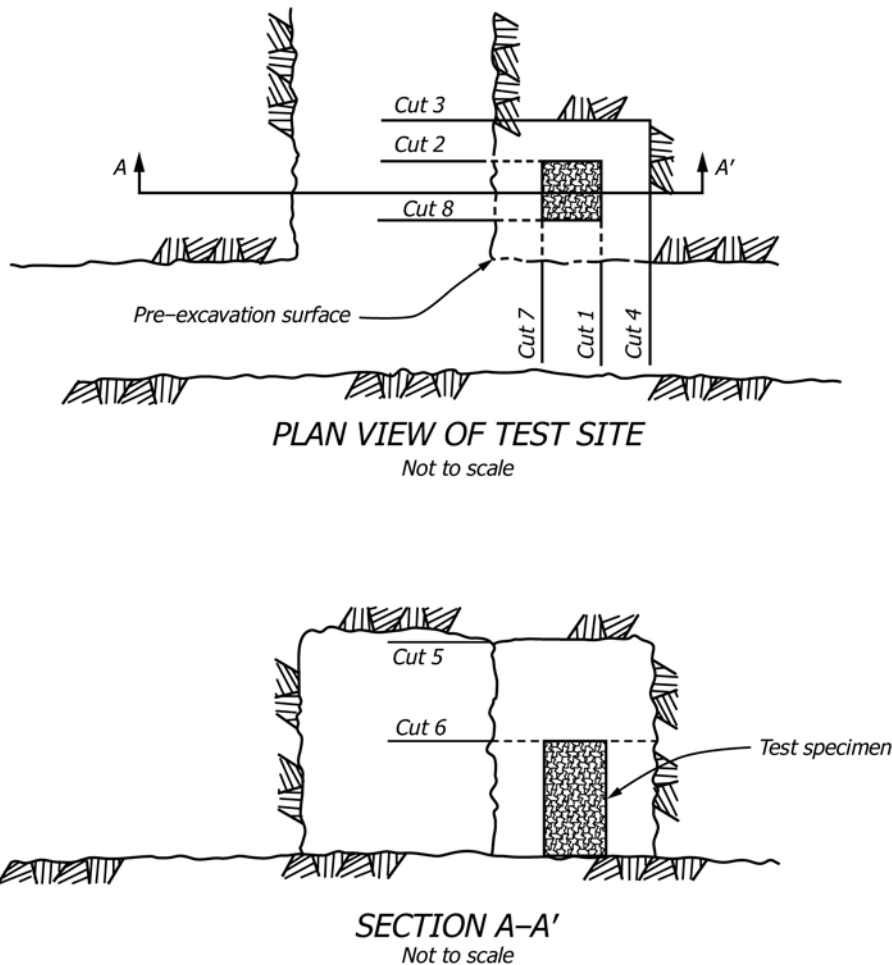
Plan and Cross Sectional Views of a Hypothetical Underground Test Site Adjacent to a Tunnel or Adit Wall and Showing a Suggested Excavation Sequence for Specimen Preparation.
